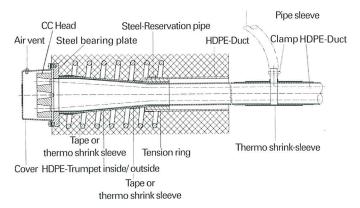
BBR CONA External, replaceable type with fabricated steel bearing plate
